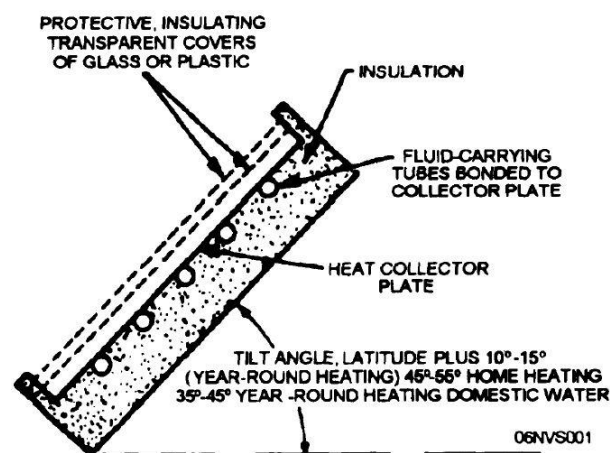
Cross section of a typical solar heat collector with heavy back insulation and two cover sheets.
